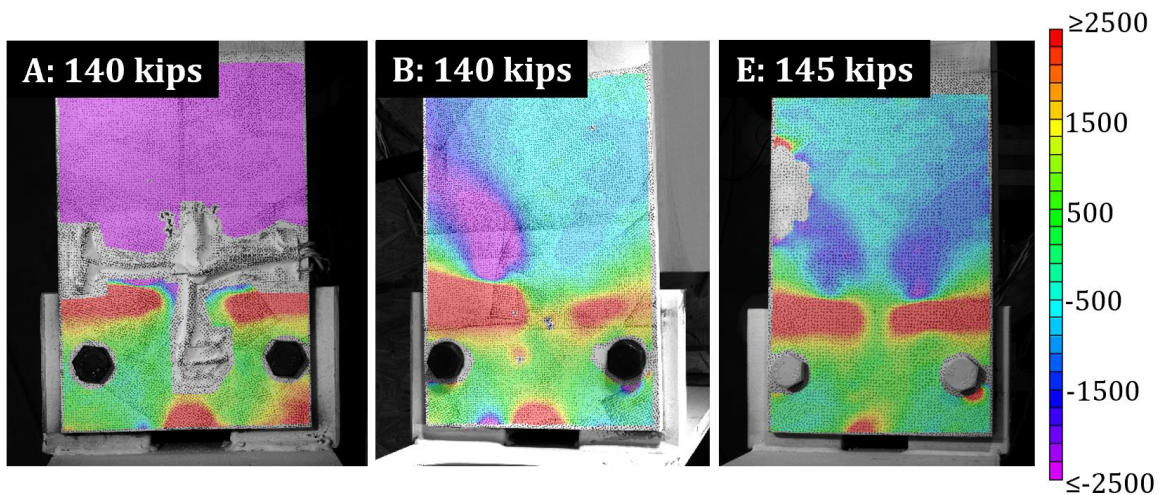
Longitudinal Yield Lines on Girder Top Flanges at Maximum Connection Shear
